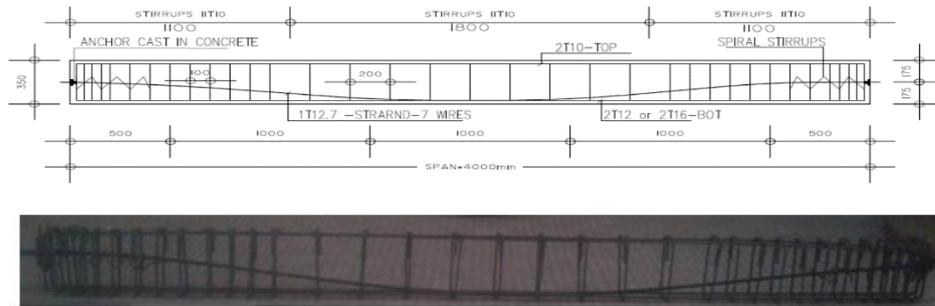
Typical Reinforcement Detailing and Tendon for Specimens (B1, B3 and B7)
